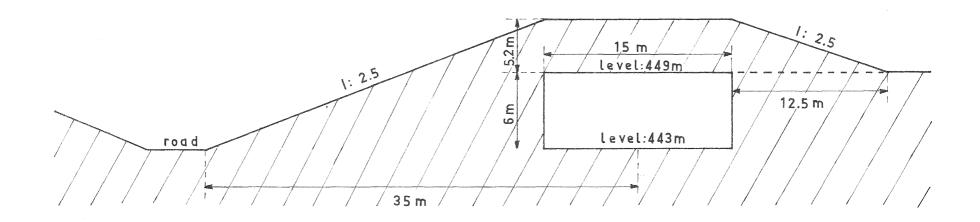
TYPICAL SHIELDING LAY-OUT AROUND ISR TUNNEL.
